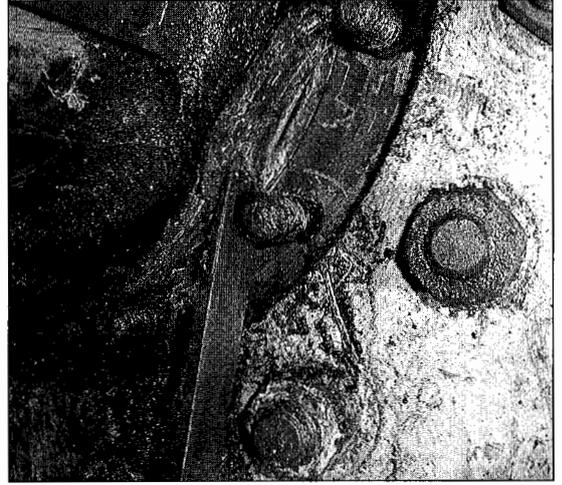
Rotary valve showing hat-leather seal and contractor ring.
